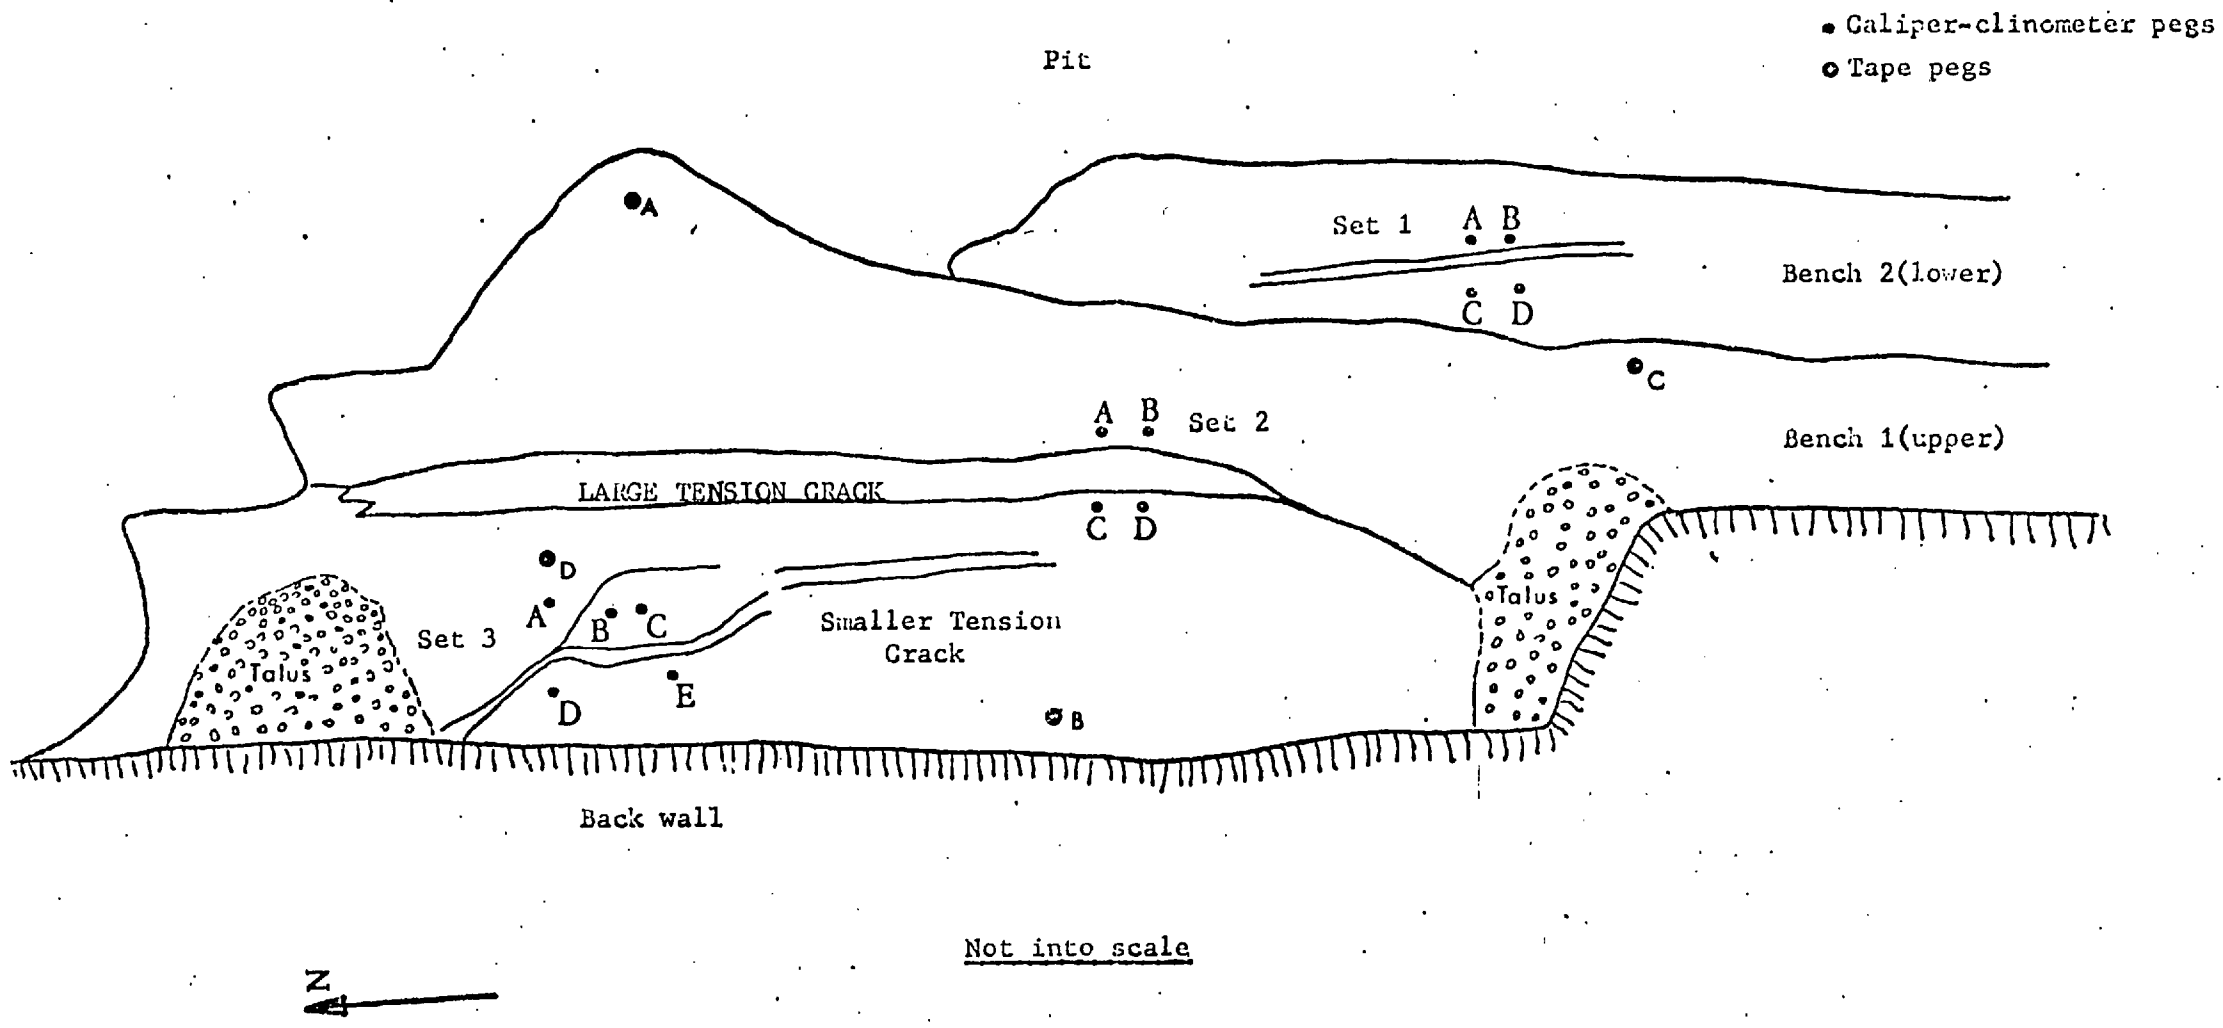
Rough plan of the slope crest('67 Failure zone) with peg locations.
